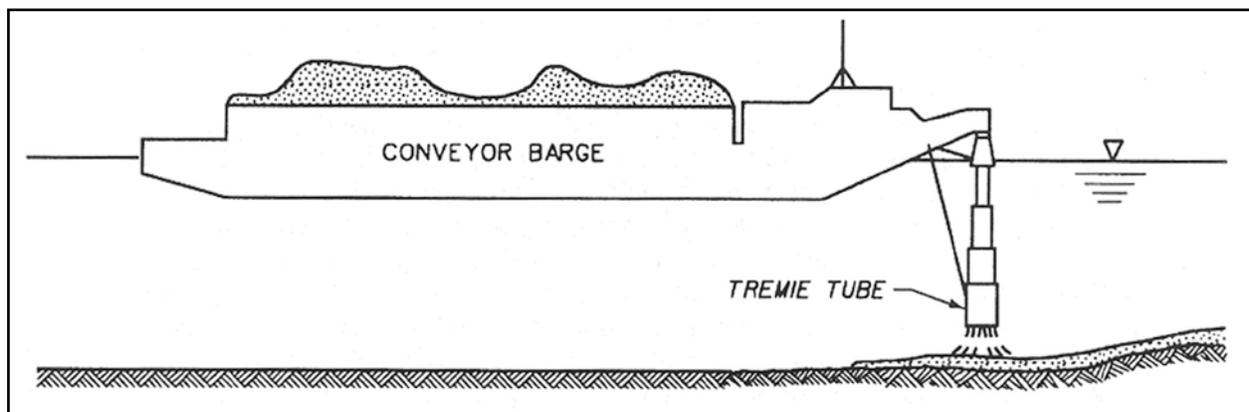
Gravity-Fed Downpipe (Tremie)
